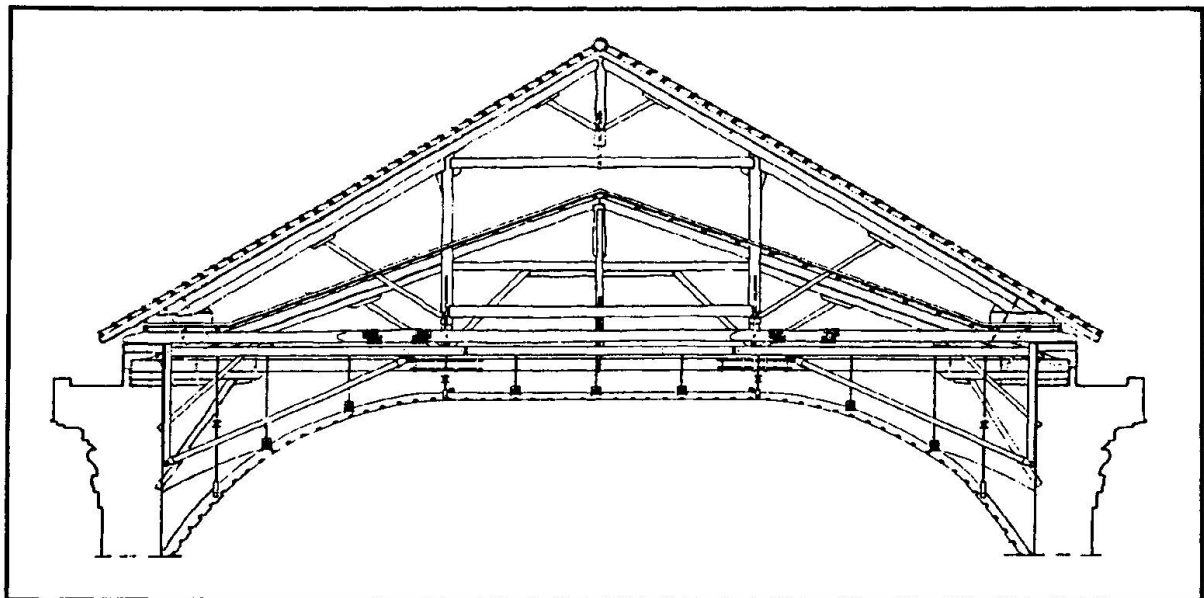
Covering section after intervention: in evidence (down from above) upper trusses, lower trusses, steel prosthesis and the wooden vault now suspended to them.
